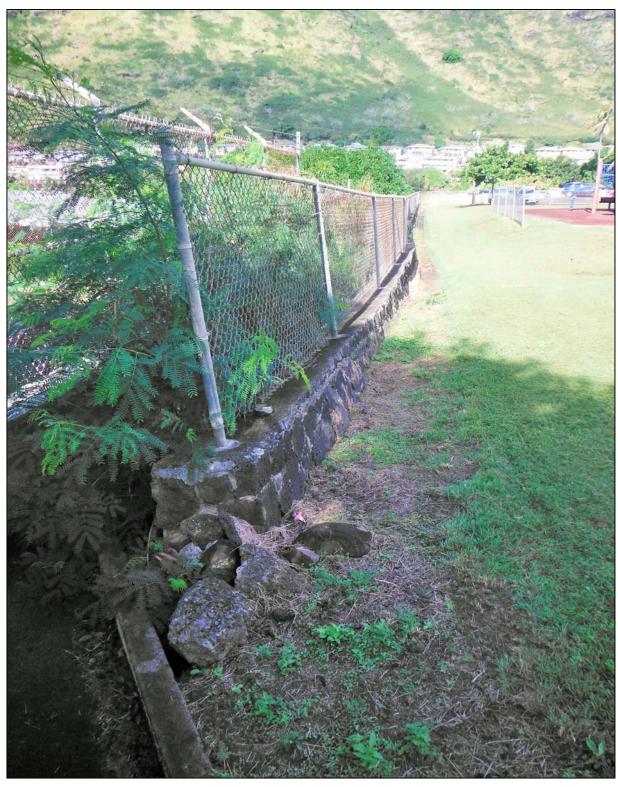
Photographic Overview of SIHP # 50-80-15-7764, Feature 2, Rock and Mortar Soil Retension Wall (East End). View to West.
